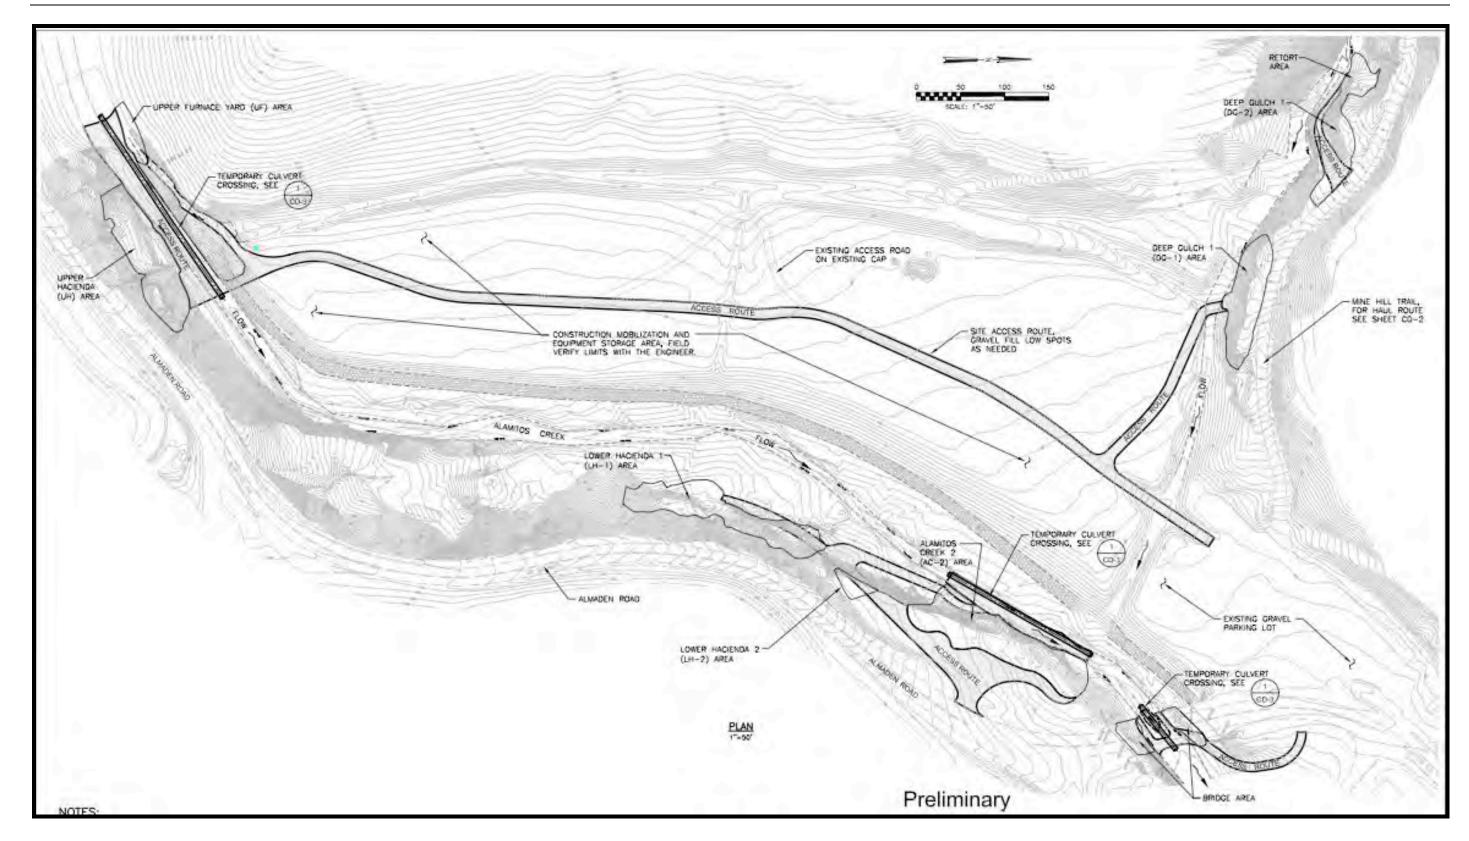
Site Access and Temporary Culvert Placements (Courtesy of CH2M Hill)
